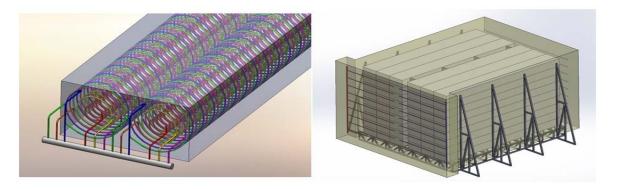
Modular concrete modules (1 m by 1 m) and Assembled Heat Storage Facility.
